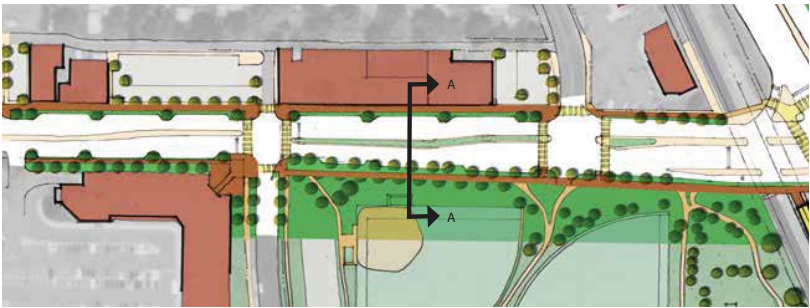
STREET SECTION A-A LOCATION THROUGH PROPOSED PLAN
